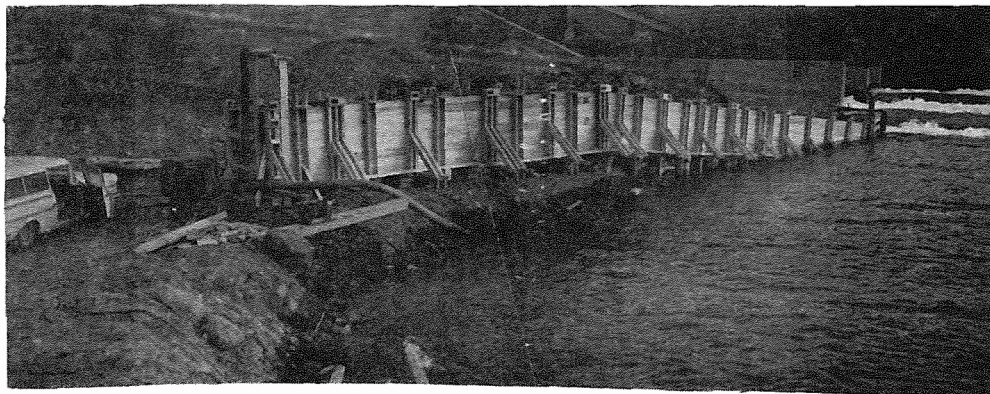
Temporary fishway completed. Pump (upper left) was used to prevent shrinkage prior to installation of 10 cfs pump. Stilling, bail, and holding pools are located at the head of the structure.
